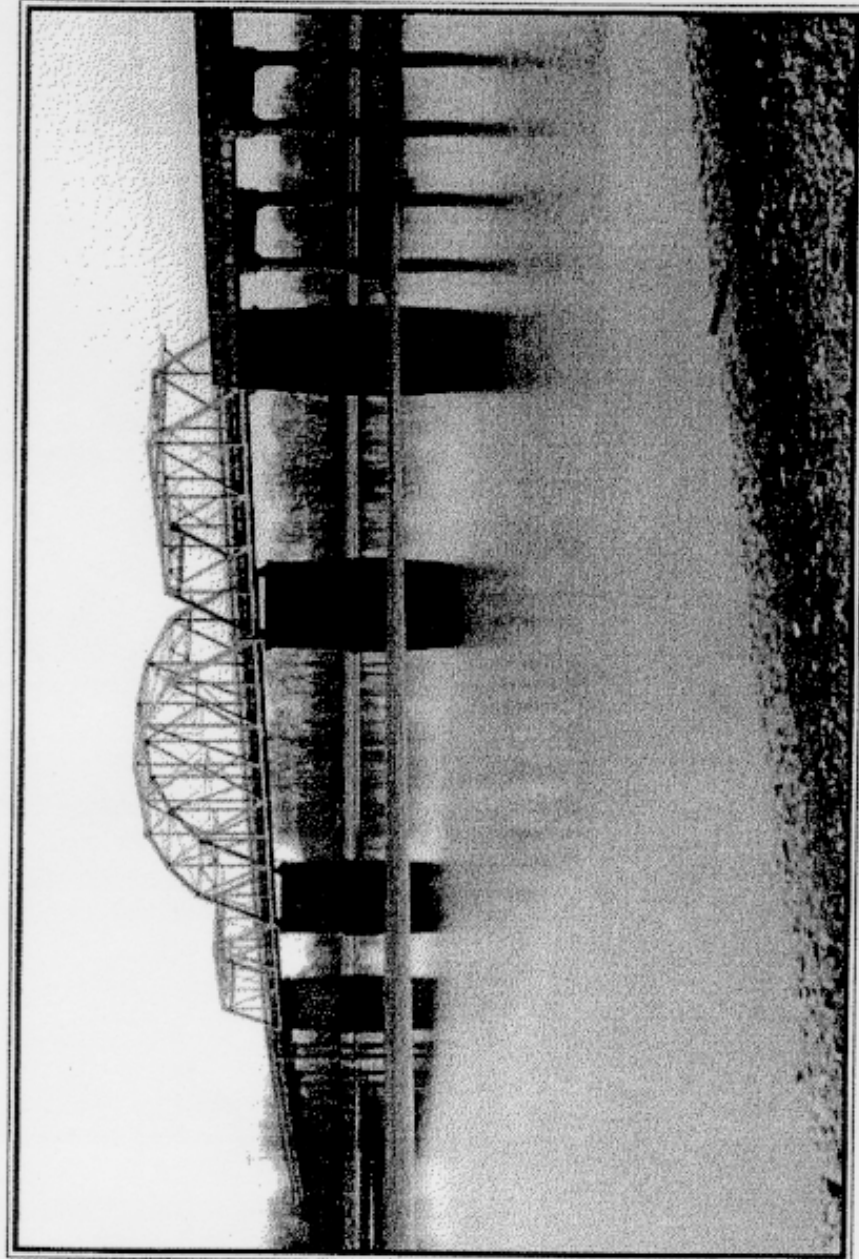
Bridge over Hiawasse River (No. 61SR0580003), view towards the southwest.
